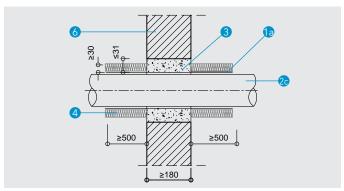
Detail A - Penetrations of steel and cast iron pipes, max. diameter 76,1 mm through walls
